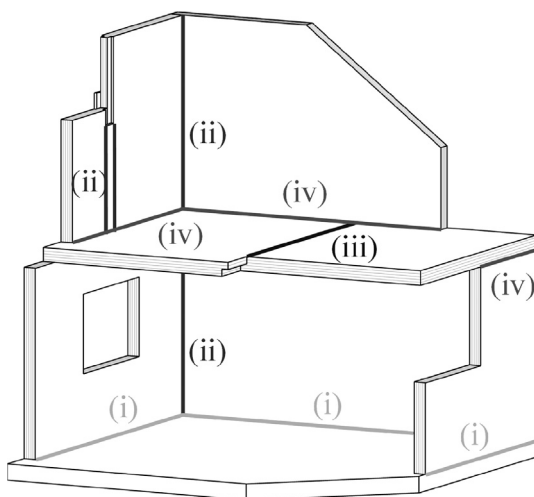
Definition of connection lines exemplarily for a CLT platform-frame structure (Brandner et al. [2]; adapted): (i) wall-to-foundation, (ii) wall-to-wall, (iii) floor-to-floor, (iv) wall-to-floor.
